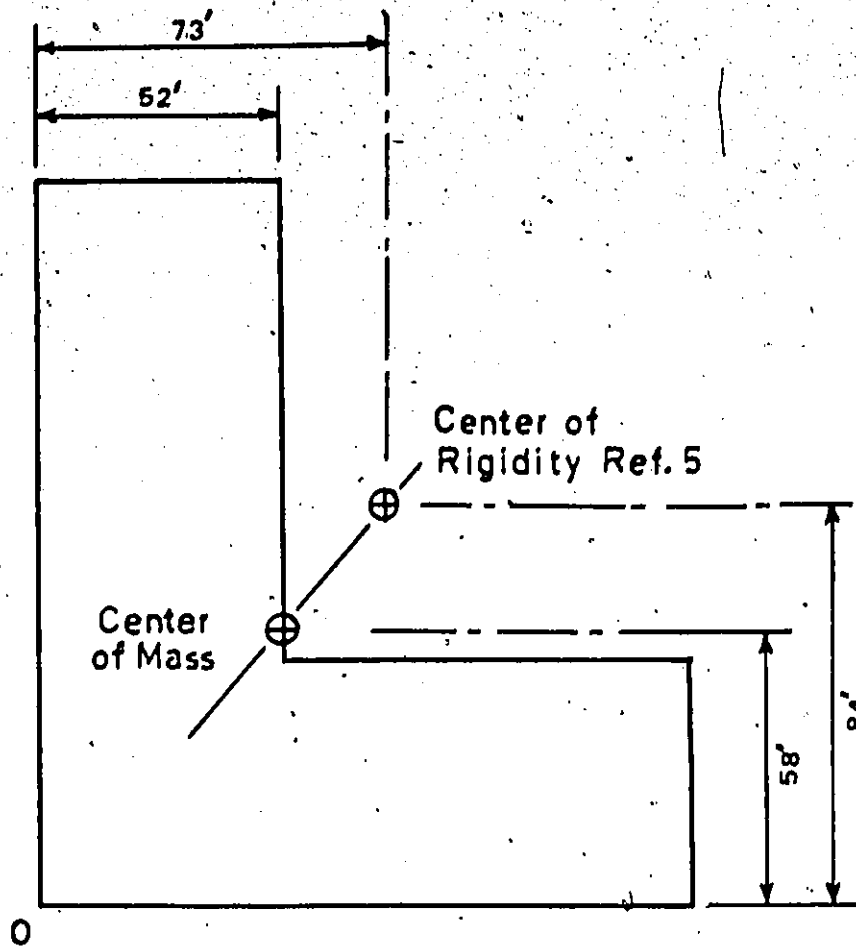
STRUCTURAL PLAN OF A L SHAPED APARTMENT BUILDING
